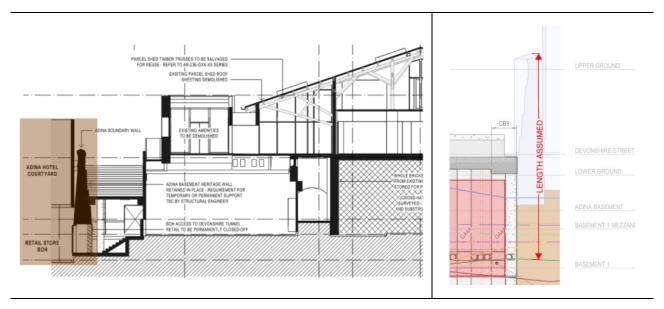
Cross-Section Elevation View of Adina Hotel Boundary Wall (BVN Dwg. AR-23D-GXX-02[5]) With Assumed Footing Depths for Characteristic Height
